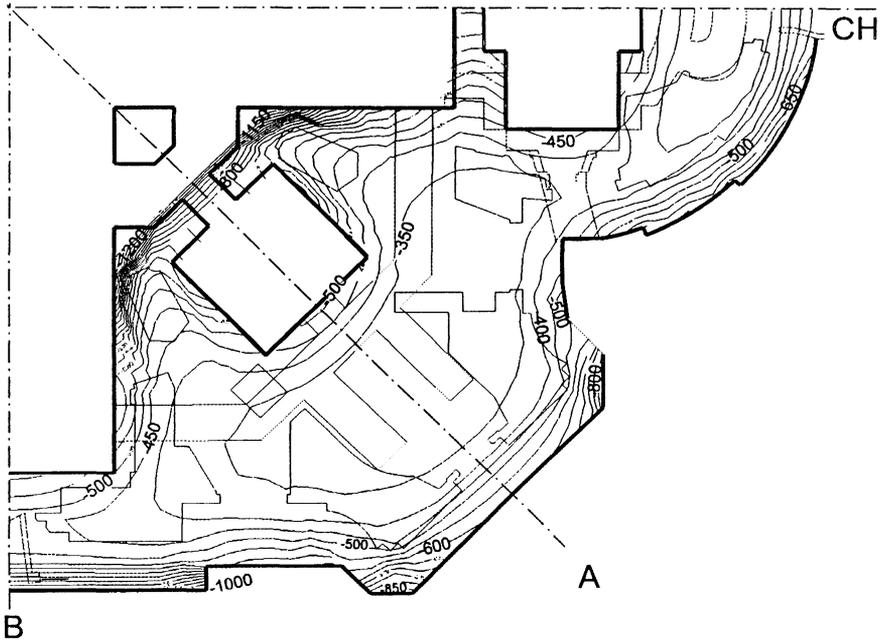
Soil pressures [MN/m^2] at foundation level $-7,15$ m, load case 'dead load including foundation and prestressing of main tension ring'
